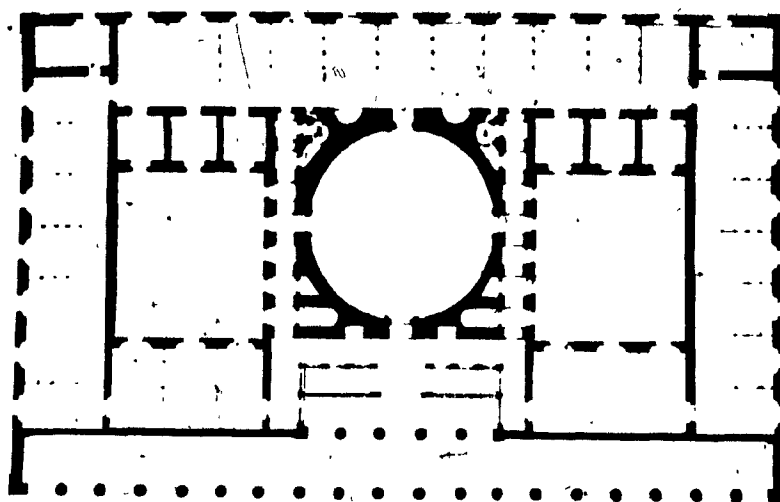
, (b,c), Altes Museum, Berlin, Karl Friedrich Schinkel, 1823-30. Plan of upper floor and section. (Schinkel, Sammlung architektonischer Entwürfe, Berlin, 1819-43).
